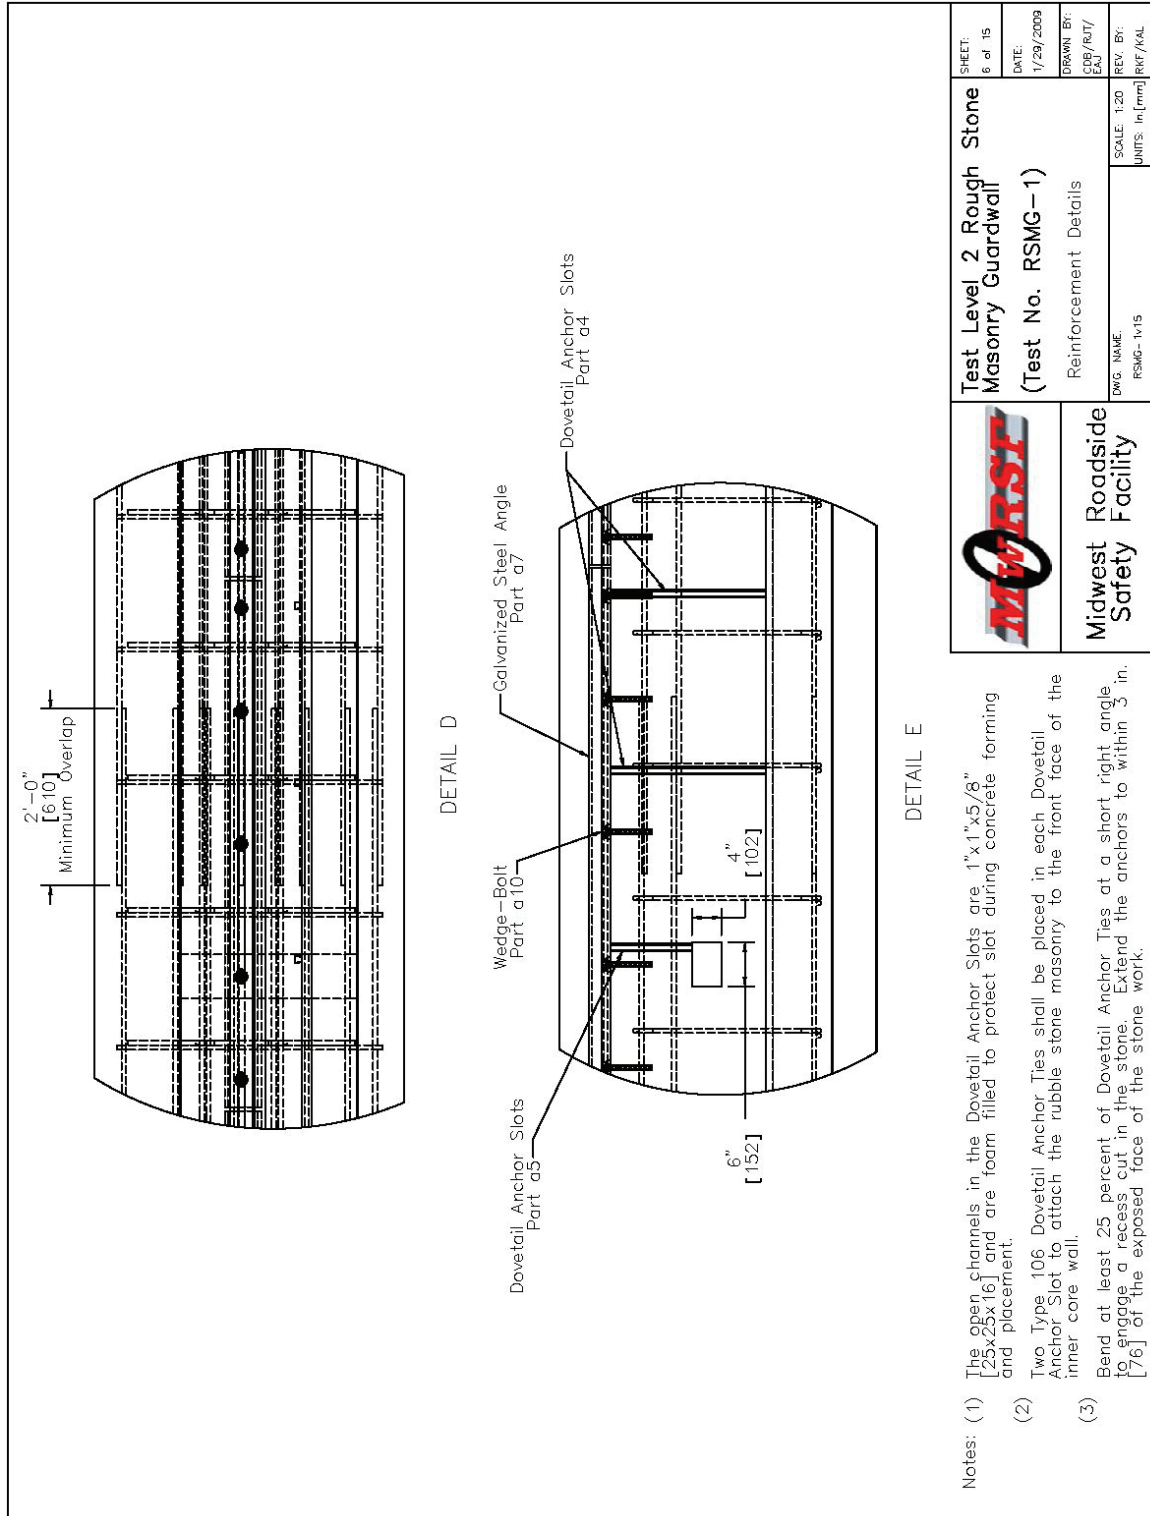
Reinforcement and Angle Attachment Details, Test No. RSMG-1
